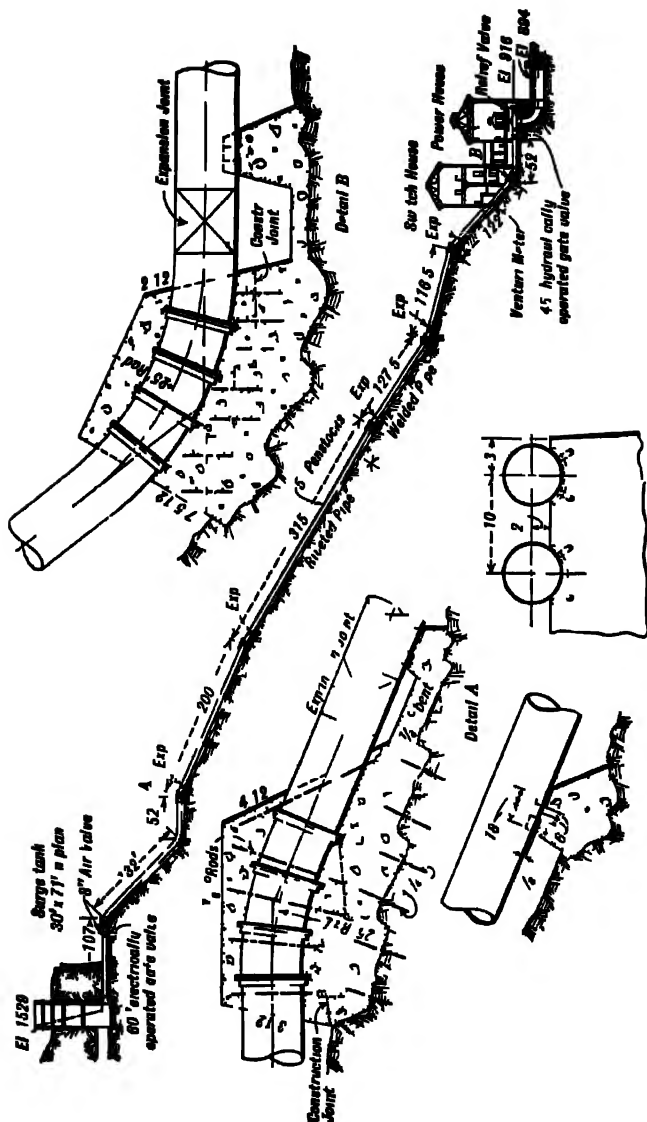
Anchors and piers for the Tallulah Falls Development Georgia Railway and Power Co (*Eng News-Record*, Vol 69 p 361)
